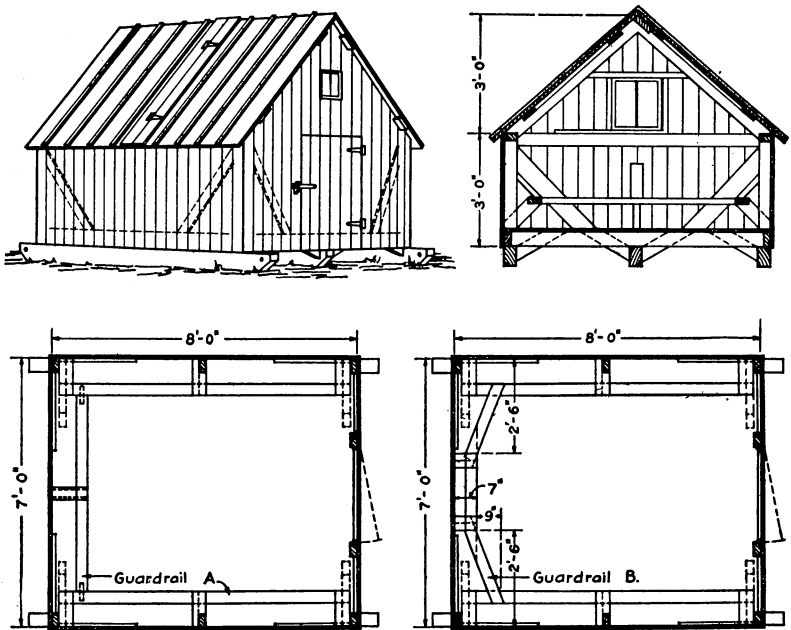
A box-type hog house. The plan at the lower left shows the usual method of placing the guardrail. The plan at lower right shows an alternate method. (No. 2126)
